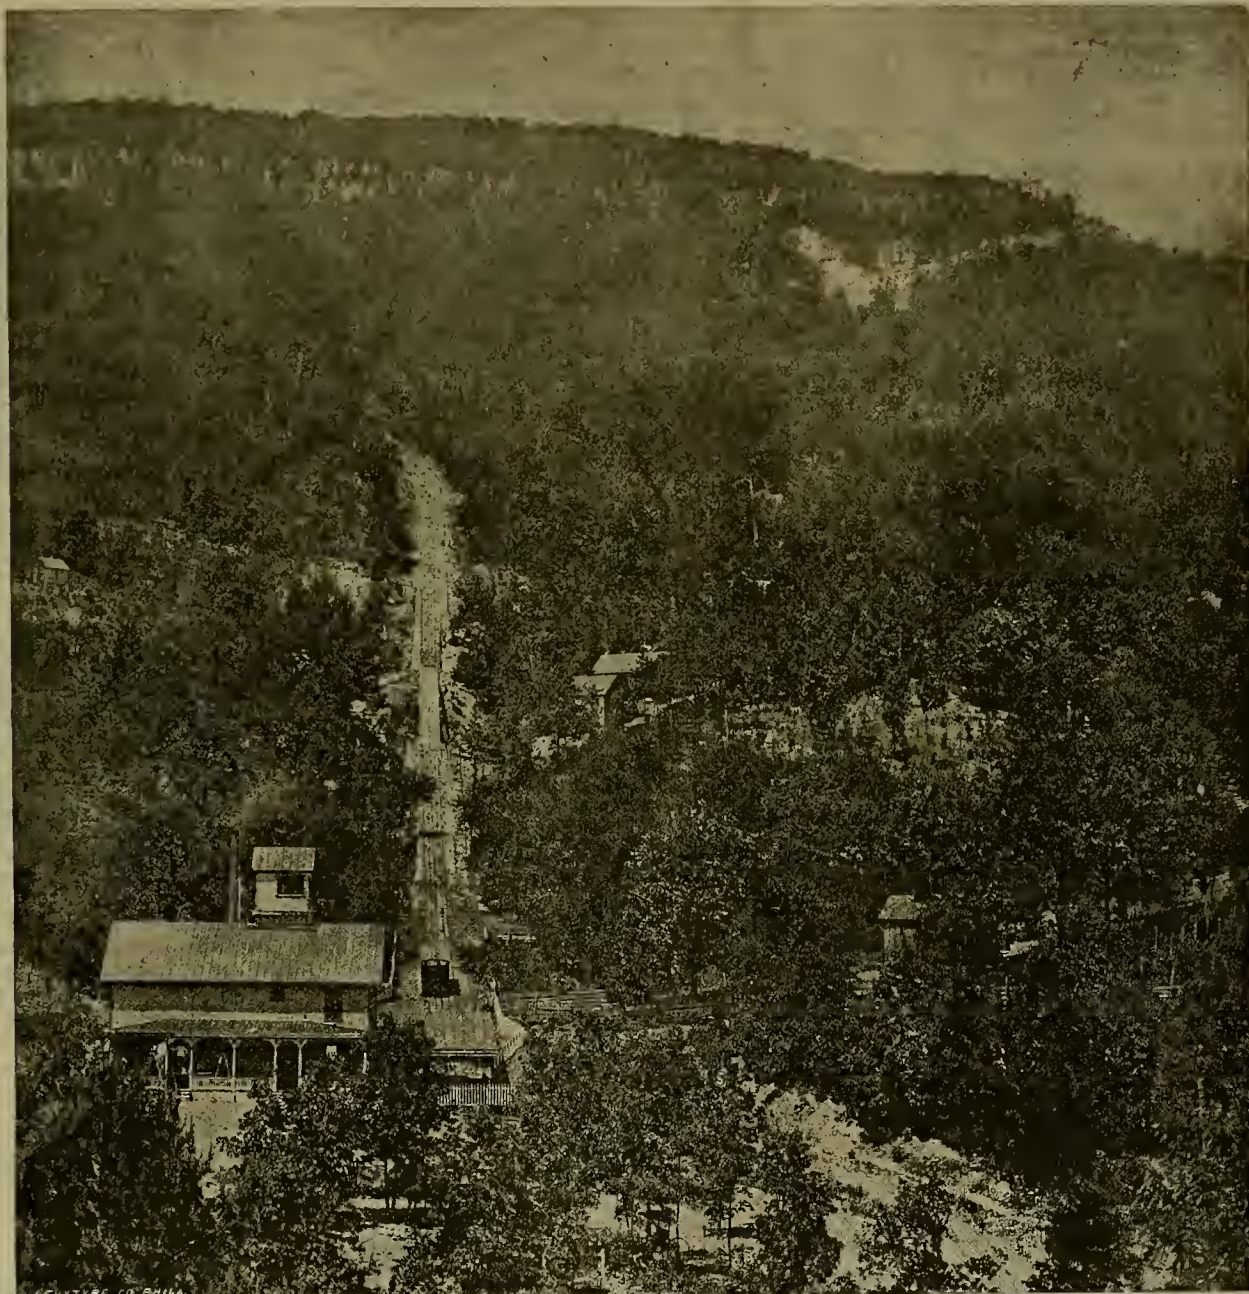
LOOKOUT MOUNTAIN RAILWAY, VIEW FROM LOWER TERMINAL.
